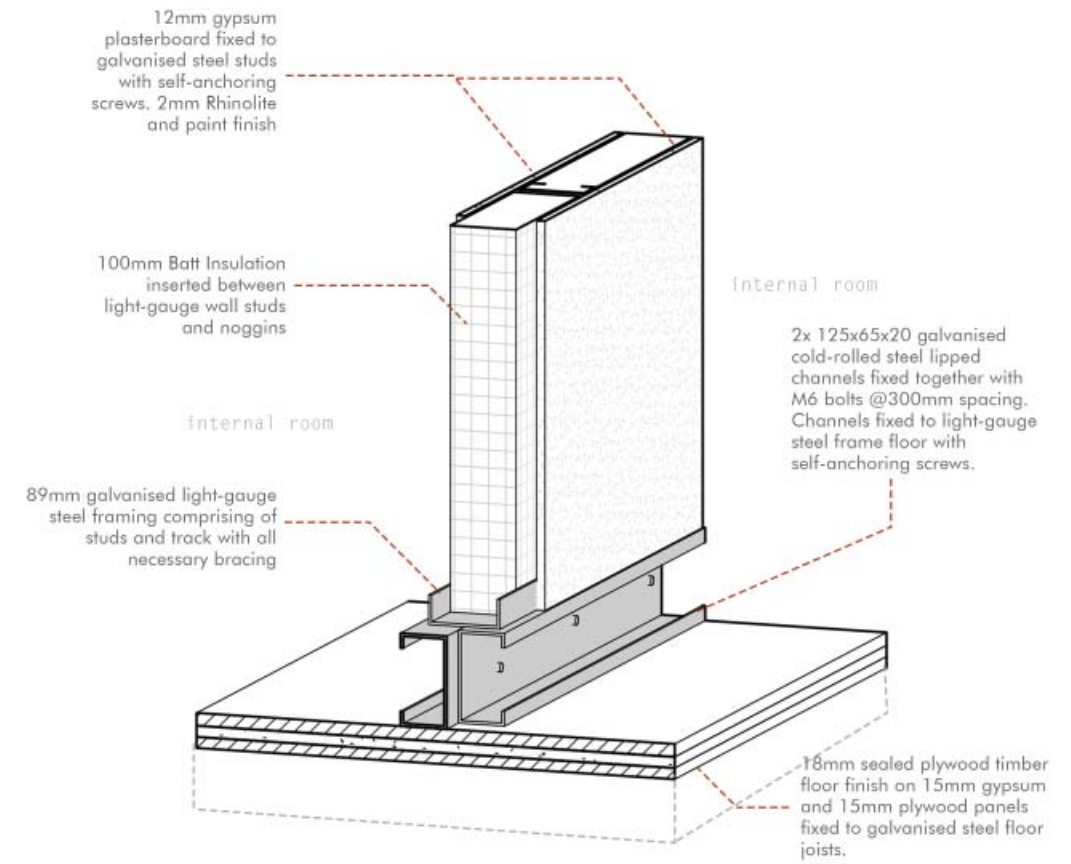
Interior wall detail development scale 1:10 (author 2017).
